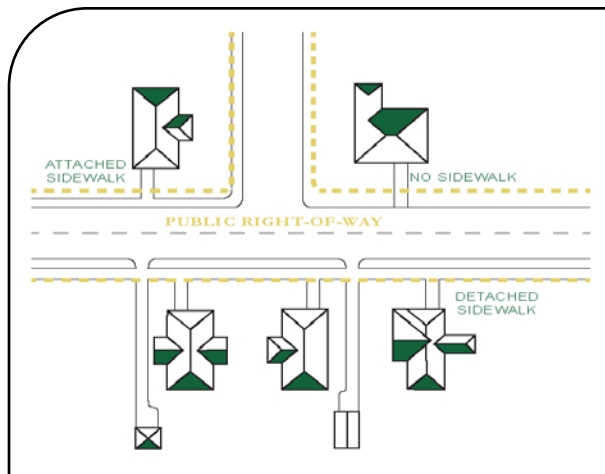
Diagram of typical types of sidewalk construction in the public-right-of-way.
